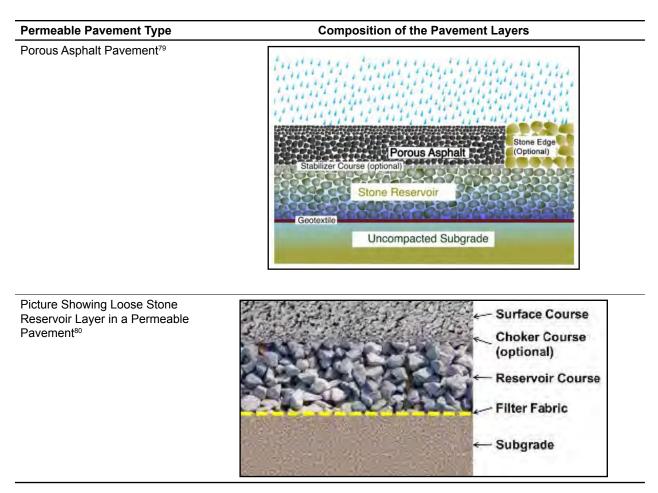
Examples of Pervious Concrete Pavements and Porous Asphalt Pavements
